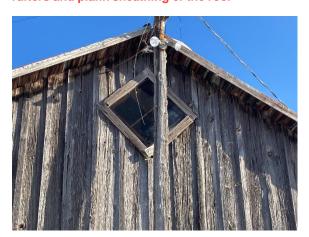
Diamond gable window on south elevation of Outbuilding No. 1
